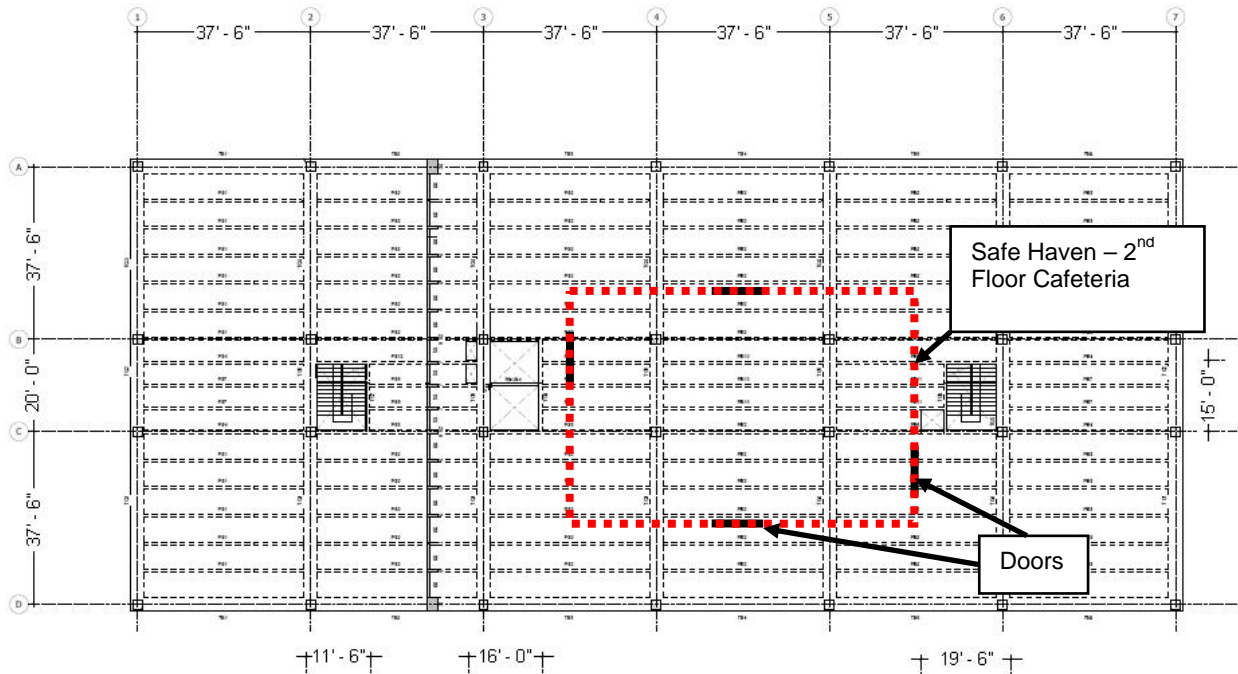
Plan View of Second Floor with Cafeteria as Safe Haven
